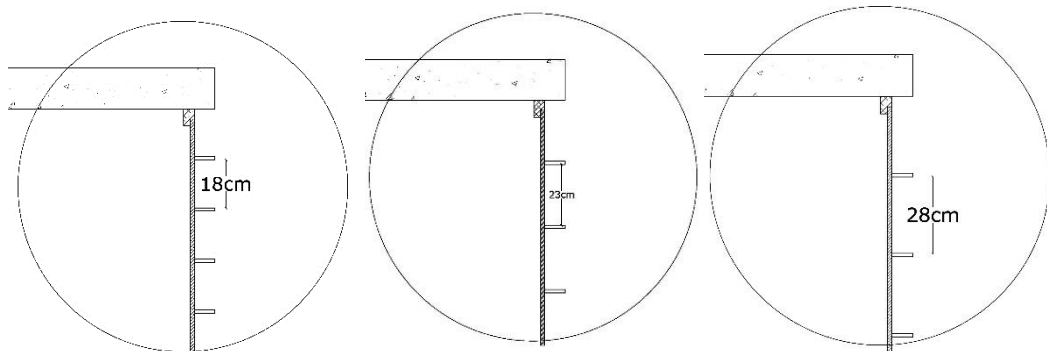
Blow up section through horizontal louvers attached to the west façade with 18cm, 23cm and 28cm spacing respectively perpendicular to the facade (Left to right).
